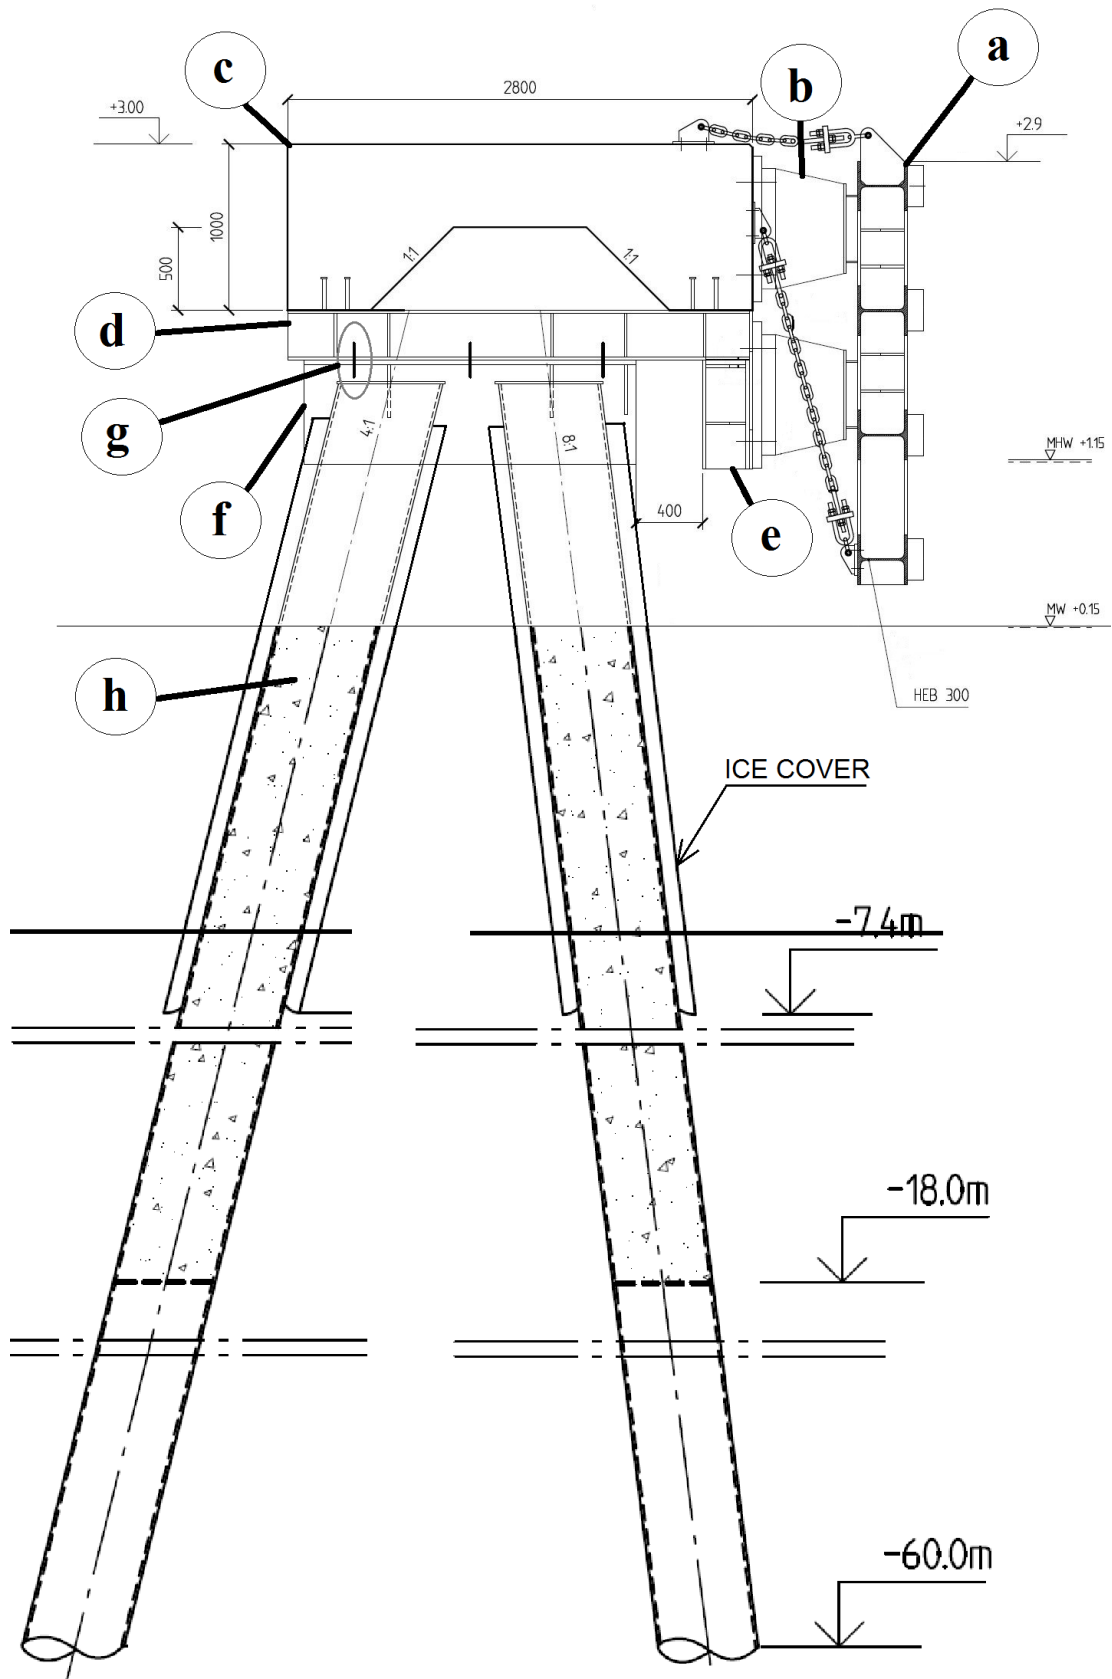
Detailed section cut of the protective pier at a pile group.
